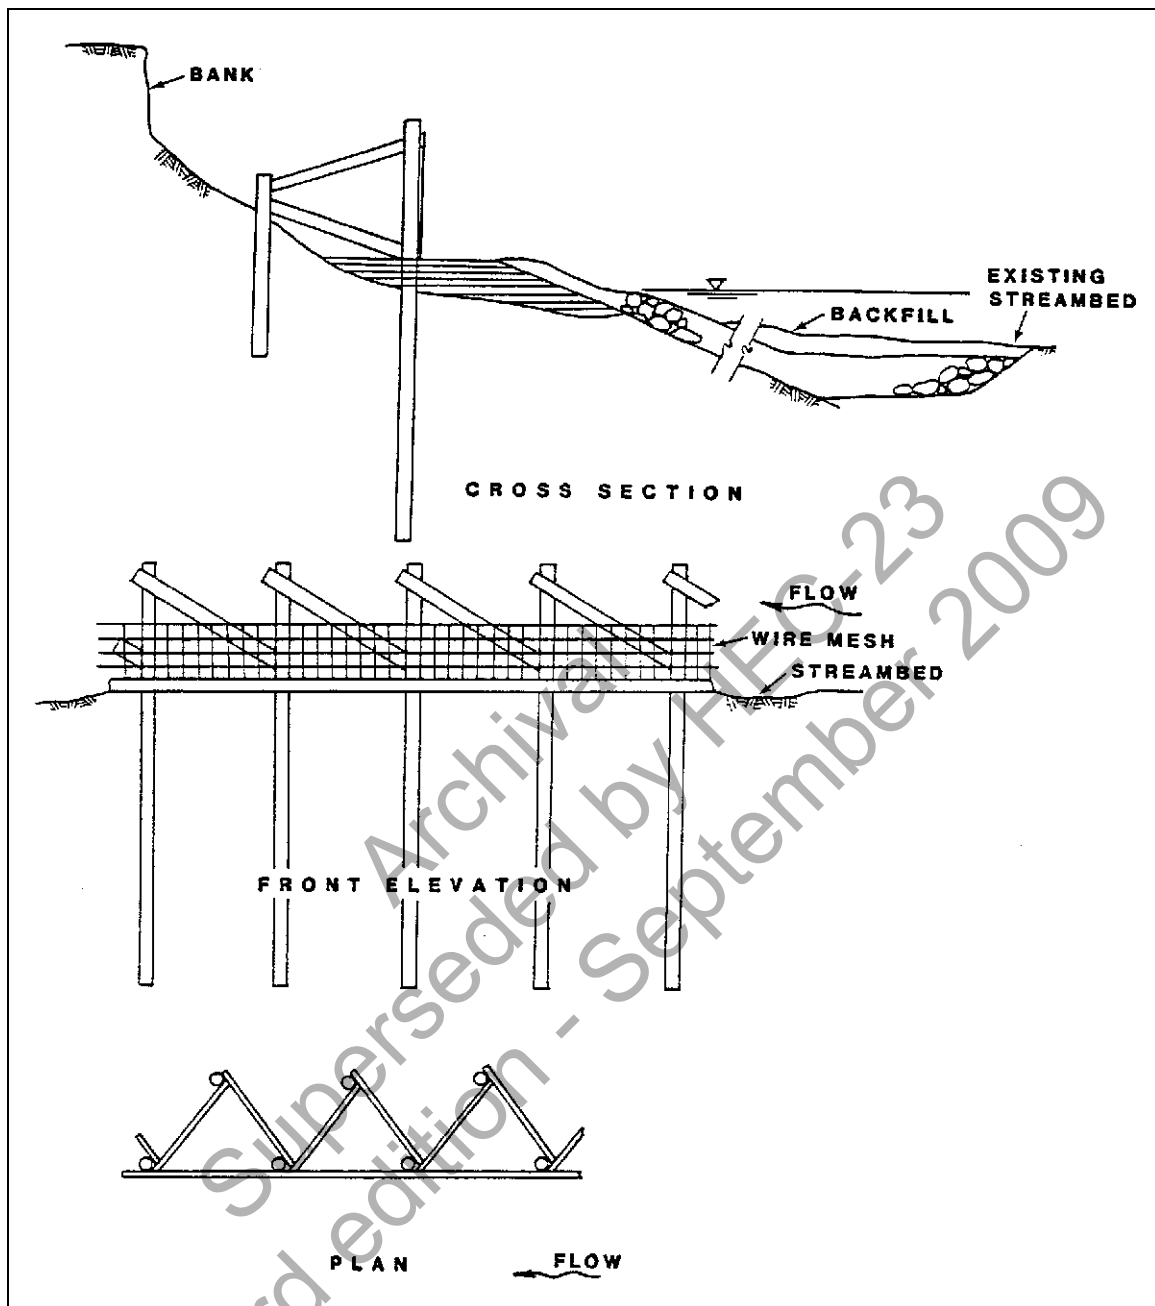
Heavy timber-pile and wire fence retarder structures (Modified from USACE, after Brown).^(2,6)
